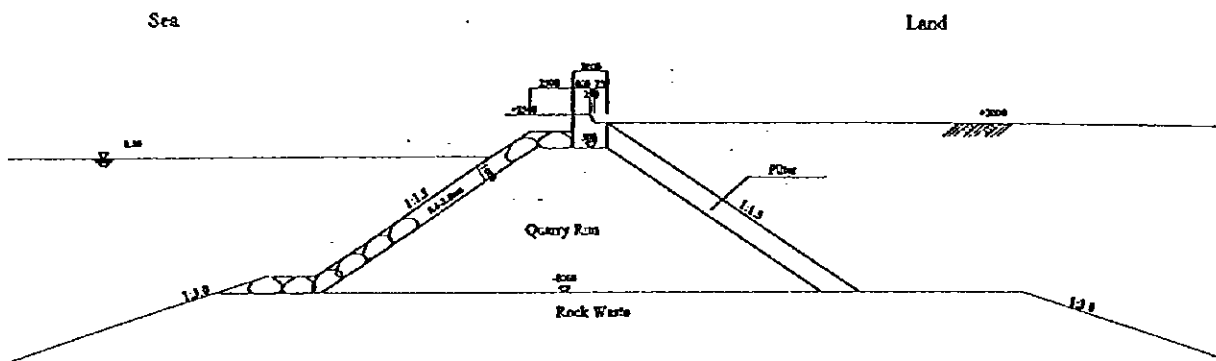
Typical Cross Section of Temporary East Revetment
